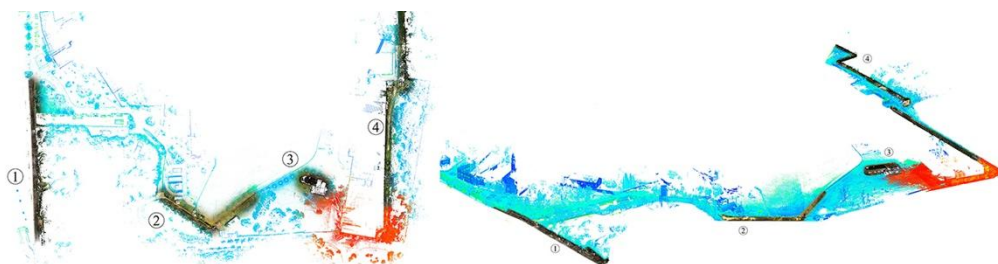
Plan (left) and axonometric view (right) from the point cloud: 1) stone portal and SW curtain wall; 2) bastion on via Morandi; 3) modern building over SE bastion; 4) NE curtain wall, partly overbuilt (graphic elaboration by Gianlorenzo Dellabartola, 2025)
